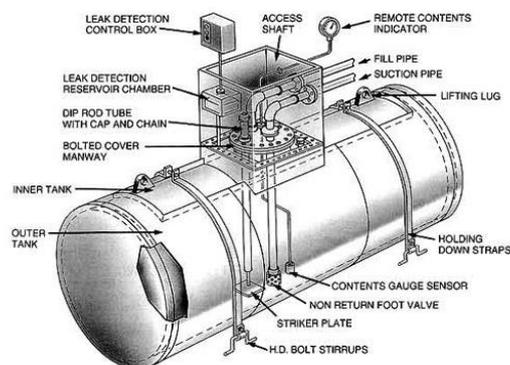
Typical Arrangement of Under-Ground Horizontal ANK
